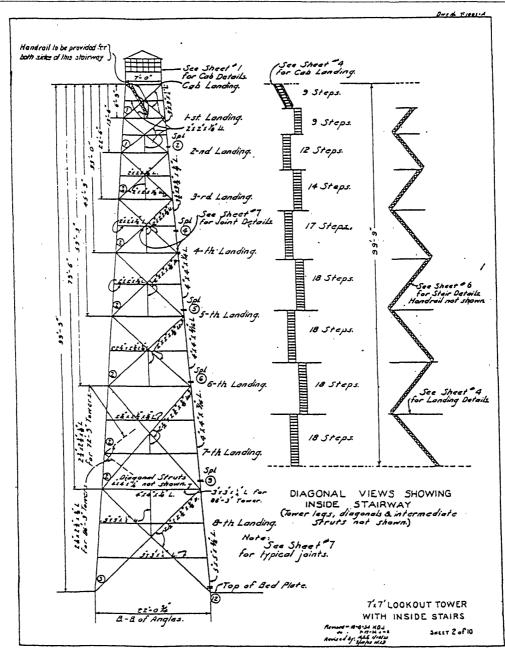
"7'x 7' Lookout Tower with Inside Stairs." This model, designed with heavier steel sections to carry the additional weight of an interior staircase with trussed stringers and wood treads was the standard used from 1917 to 1950 in New York state. The diagram incorporates revisions to 1934. (W. B. Greeley, Specifications and Plans for Lookout Towers. Washington, DC: U.S.D.A. Forest Service, 1924)
